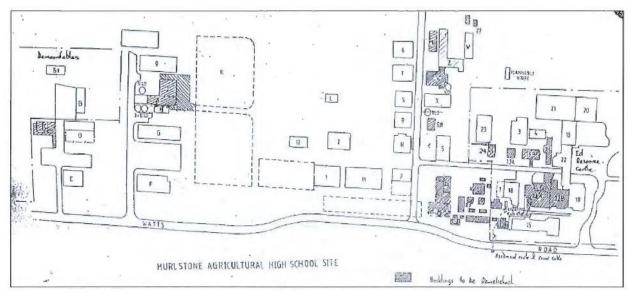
1989 site plan showing the proposed demolition of the Veterinary Research Station buildings
